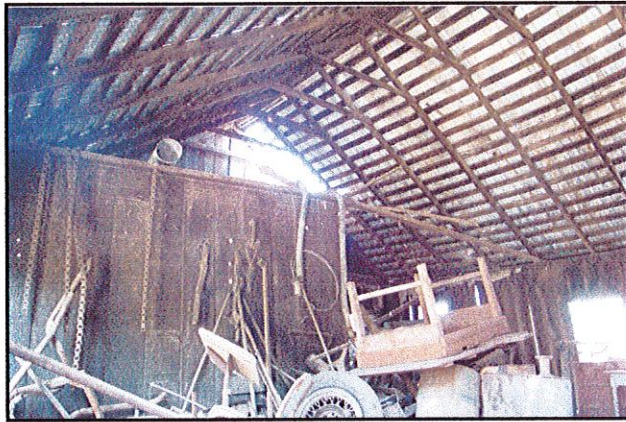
Ancillary wood barn, ca. 1915. This interior view is facing northeast. Note the corrugated metal roof and the extensive collection of the Pfeiler family's farming implements. Photograph date, November 5, 2002.
